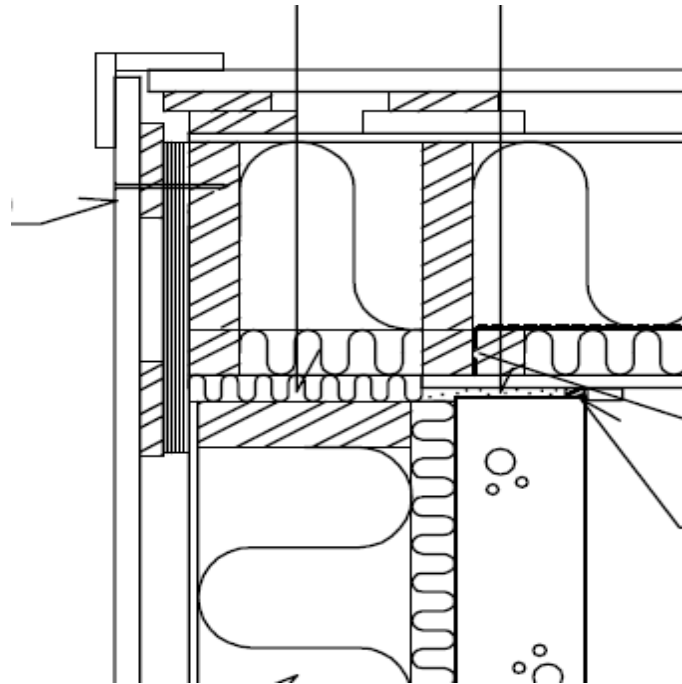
Structure on the corners, corner boards are used. Nieminen A. 2014. Detail drawing 5.12.
